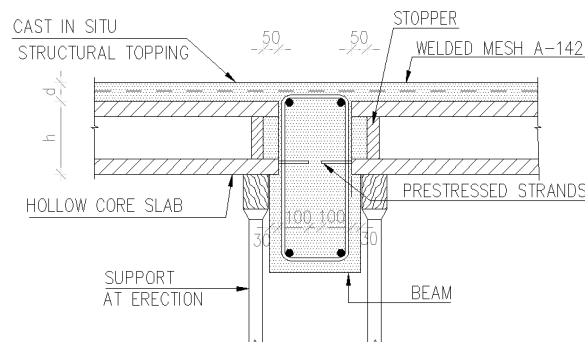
Typical fixing detail at drop beams when both side is Hollow core slab
